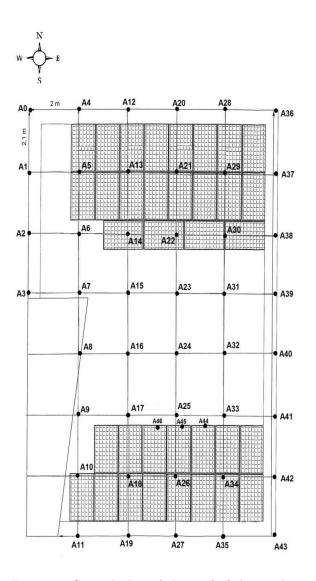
Ground plan of the roof of the residence A with the measurement positions.
